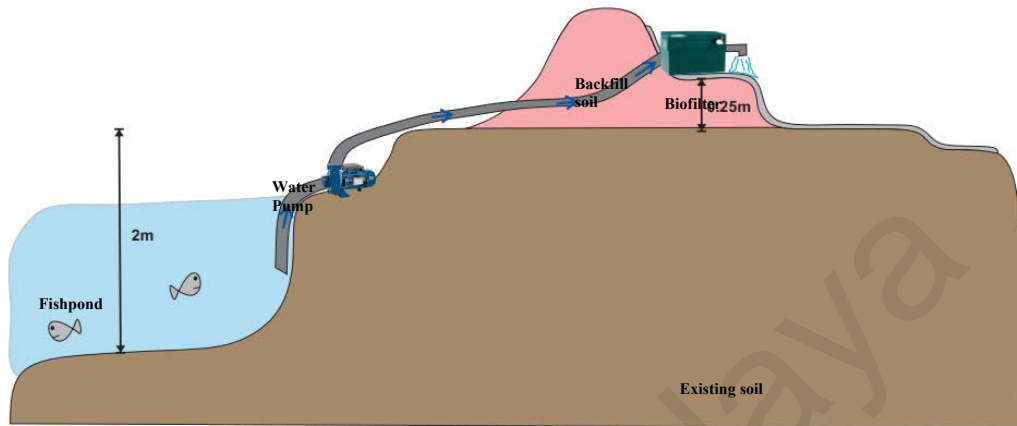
The water stream site plan of Rumah Hutan Jeram.
